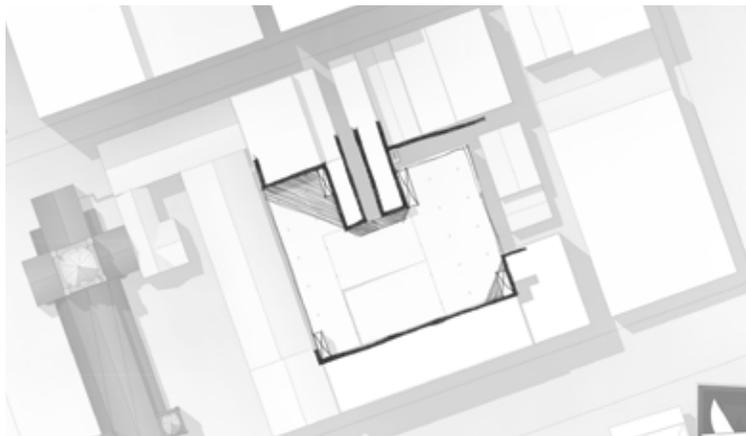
Plan of site showing 'dark' spaces - areas that receive minimal sunlight
